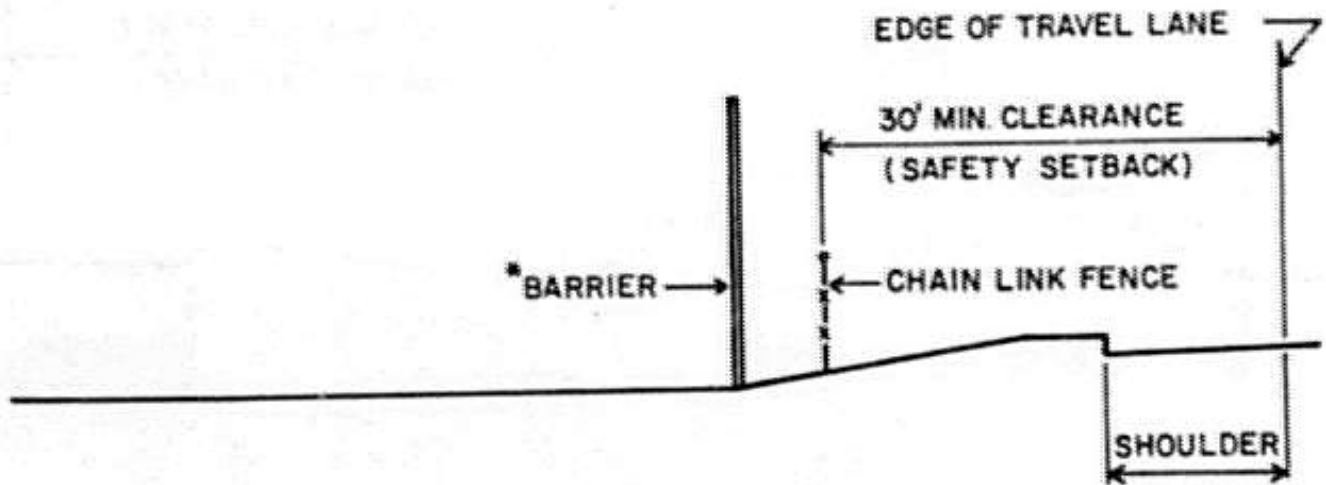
PREFERRED TYPICAL CROSS-SECTION, HIGHWAY-NOISE BARRIERS TYPE 4 THRU 7
